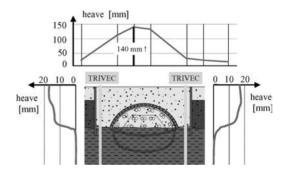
Deformations in cross section MQ 8 after construction of the jet grouting cover.
